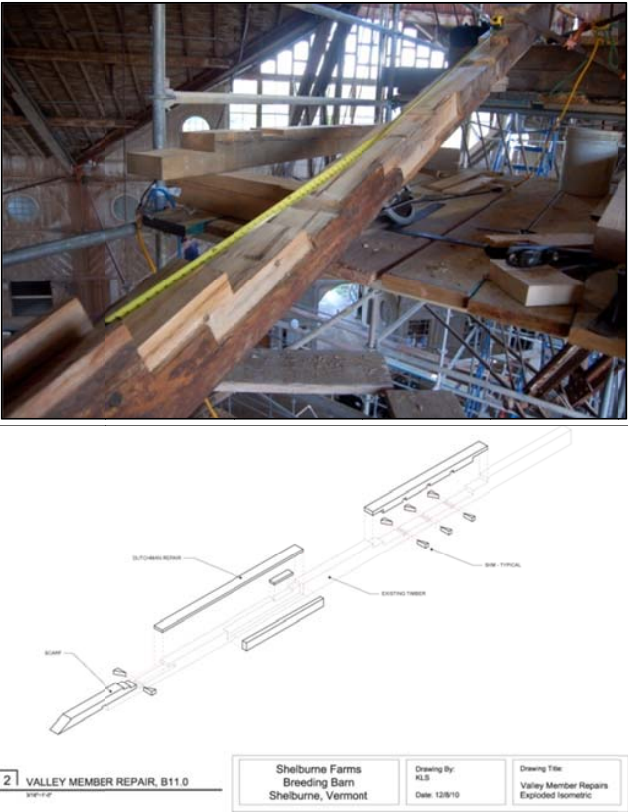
The valley member at B11.0 with decayed material removed in the upper half of the span (top). Note the shear block mortises cut in the member and in the timber dutchman on the scaffolding behind the valley timber. The extent and location of the damage necessitated a change in the types of repairs employed (bottom).
